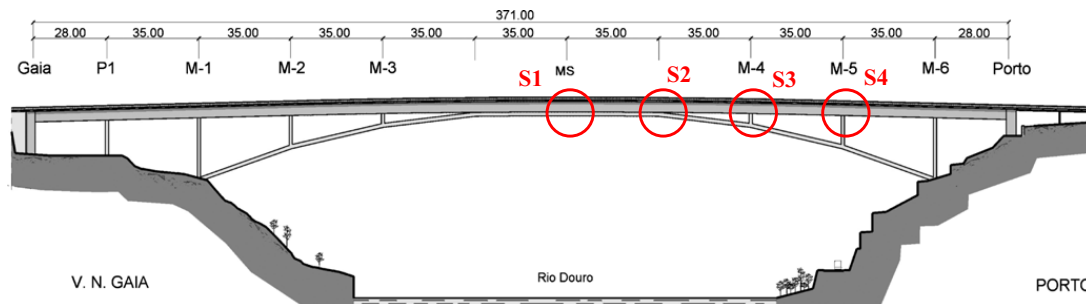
Elevation of the bridge showing the instrumented sections: S1–S4.
